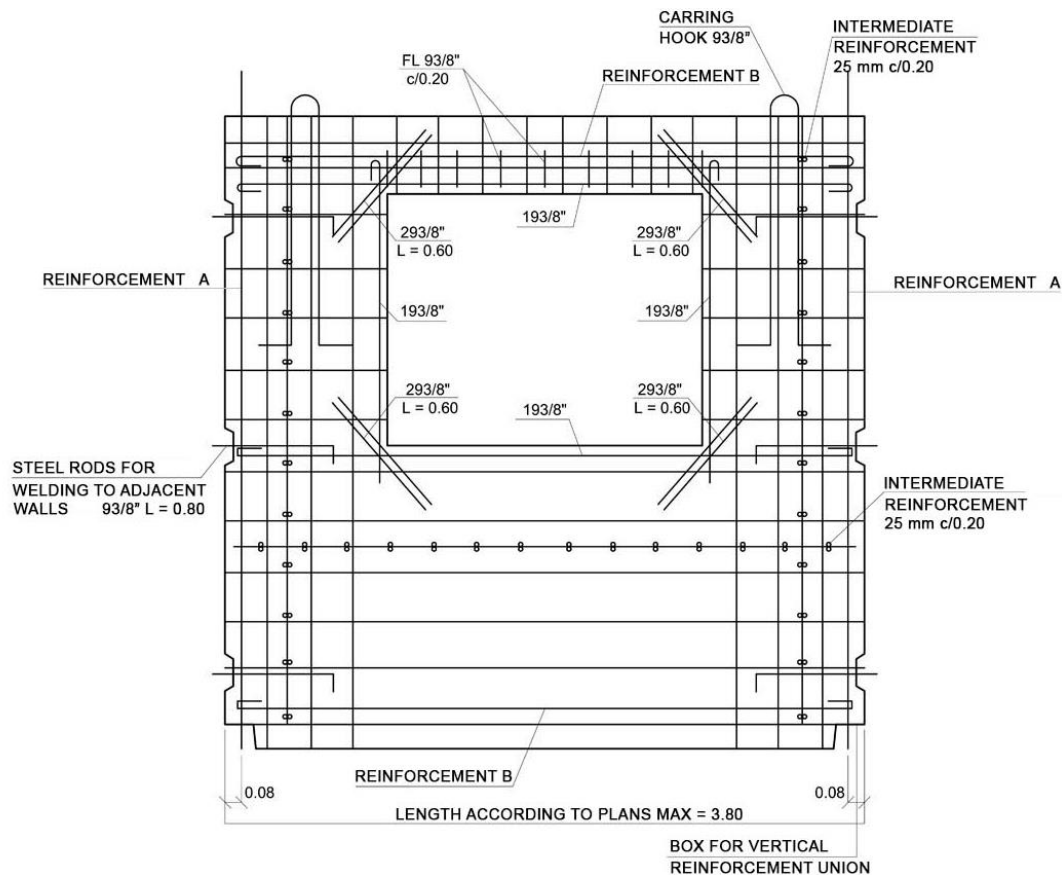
Reinforcement of prefabricated concrete *Sayab* panels.
